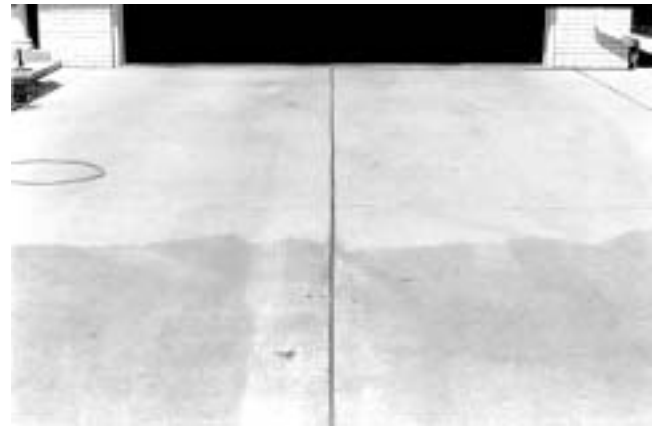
Concrete slab discoloration due to the use of calcium chloride mixture. Concrete in upper part of the photo did not contain the admixture.
